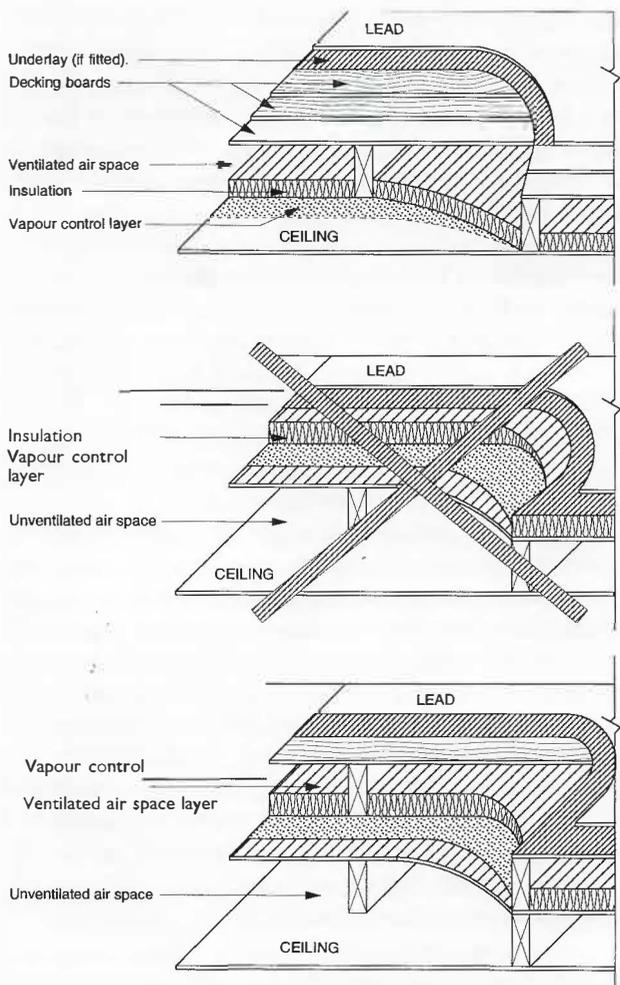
Principles of modern roof design: CDR (cold deck roof), WDS (warm deck sandwich) and VWR (ventilated warm roof).
